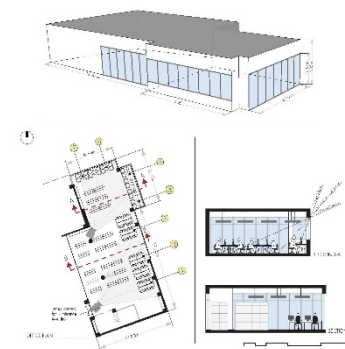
Geometric properties in plan, section and 3D view of Zone 2 (Library).
